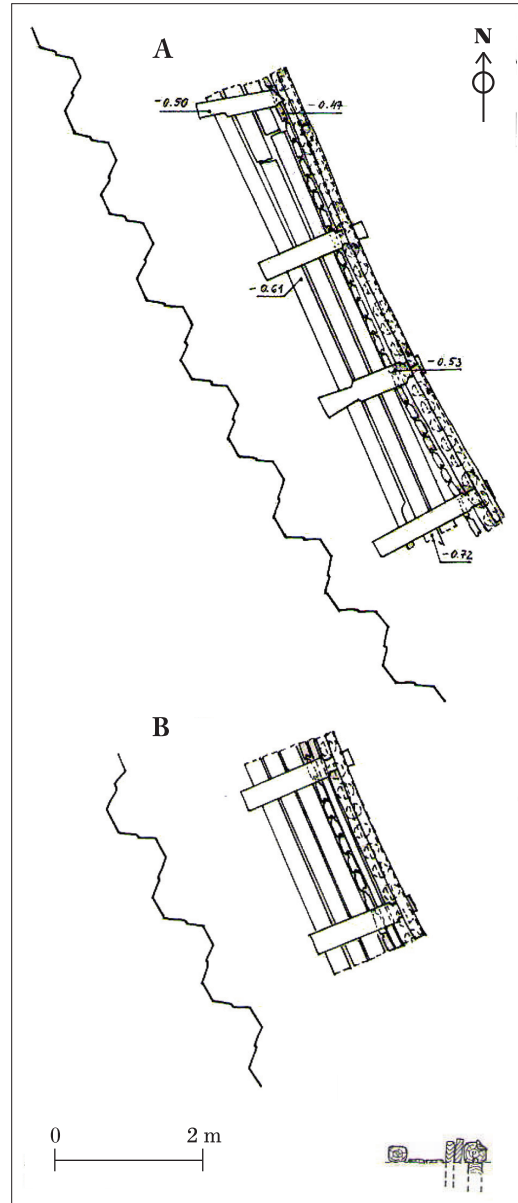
A – construction of the second half of the 17th c bank fortifications, B – construction of the second half of the 17th c bank fortifications with the edgewise placed plank.
